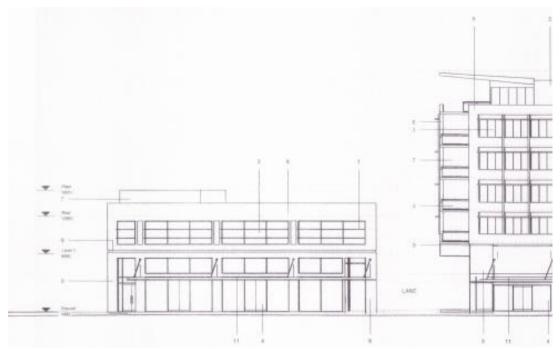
Existing approval of two storey commercial/retail building on 220 Memorial Avenue, comprising 2/3 of the subject site
